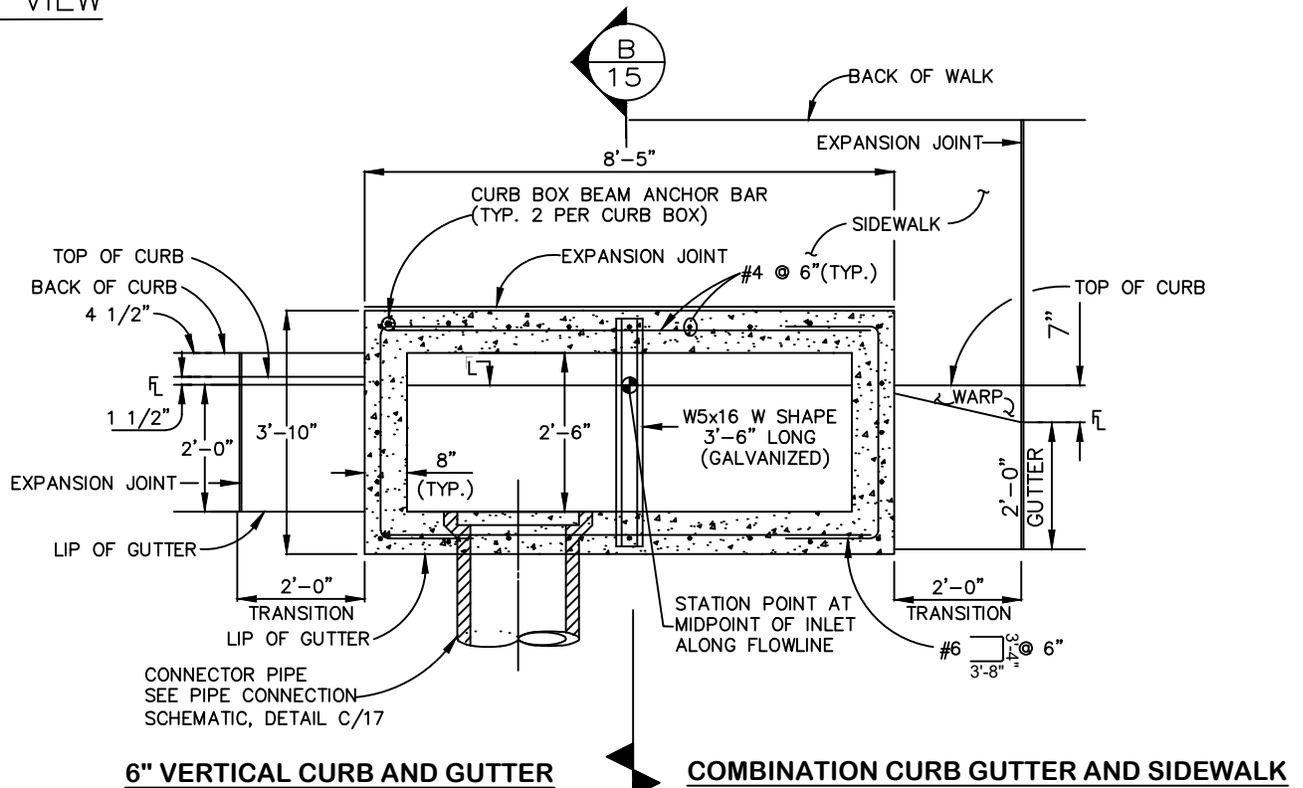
DETAIL - PLACEMENT OF ADJ. CURB BOX ON SUPPORT RAIL (TYP.)
